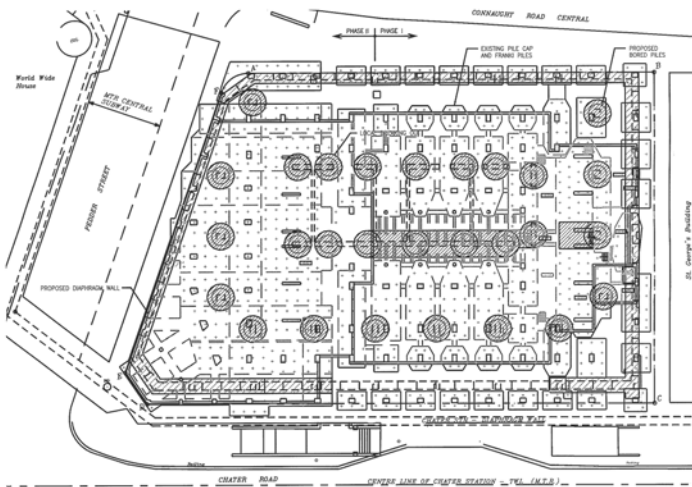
Site Layout, Existing Foundation and Proposed Works
